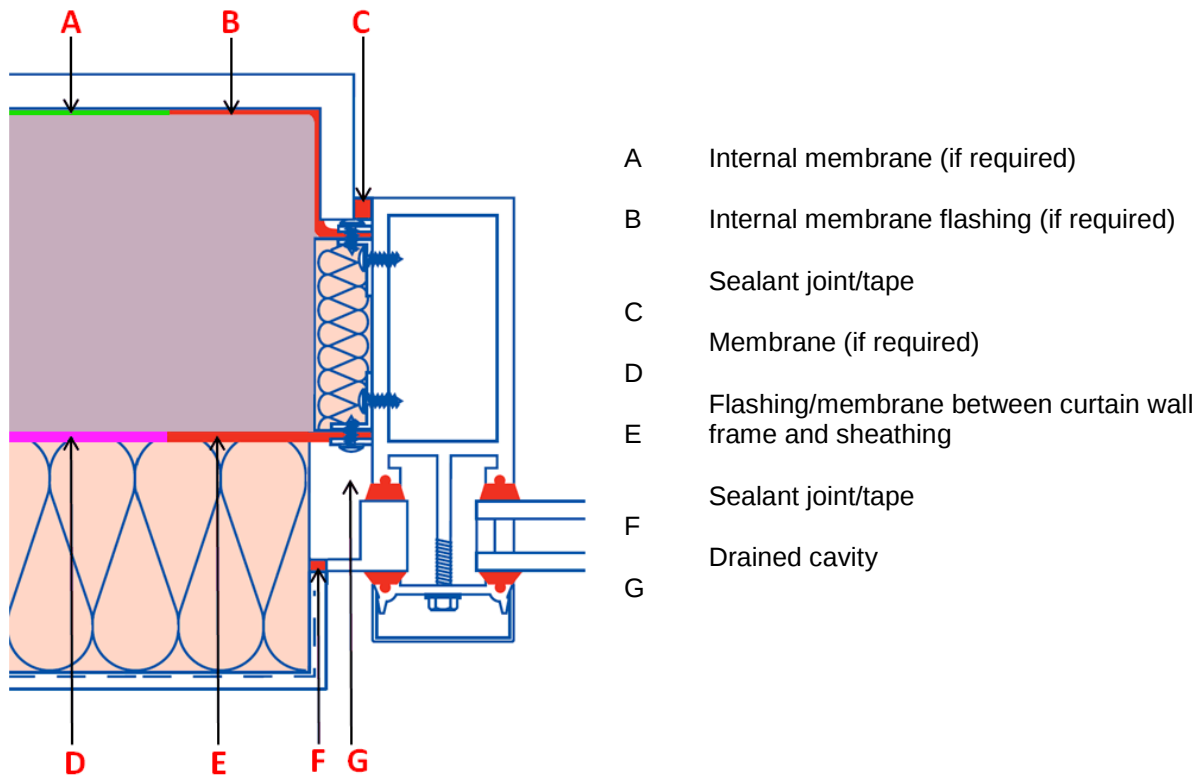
Curtain wall interface with EWIS, solid back wall, no cavity
